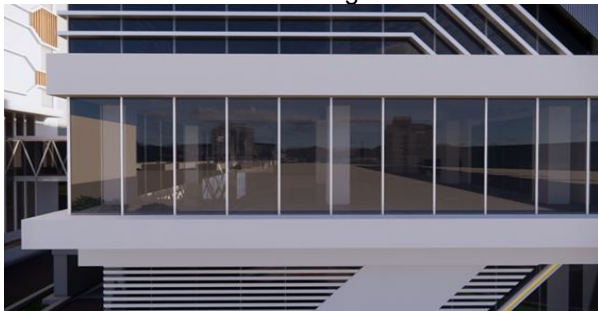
Glass Façade with Curtain Wall Frame (Source: Author, 2023)
